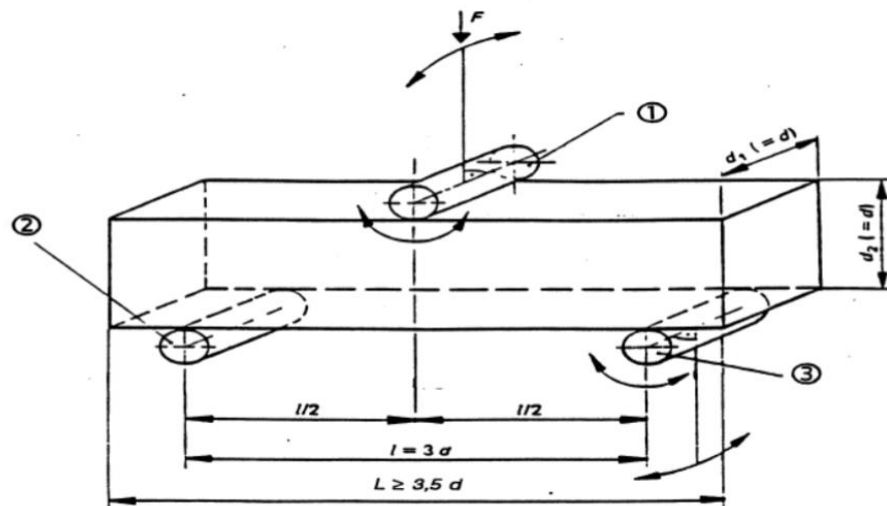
Arrangement of Flexural Strength Test on Specimens
